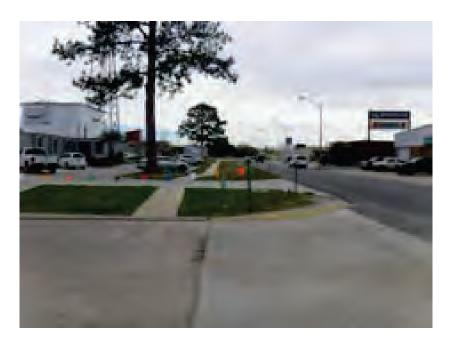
David Drive at Victor II Boulevard, view facing southwest.
